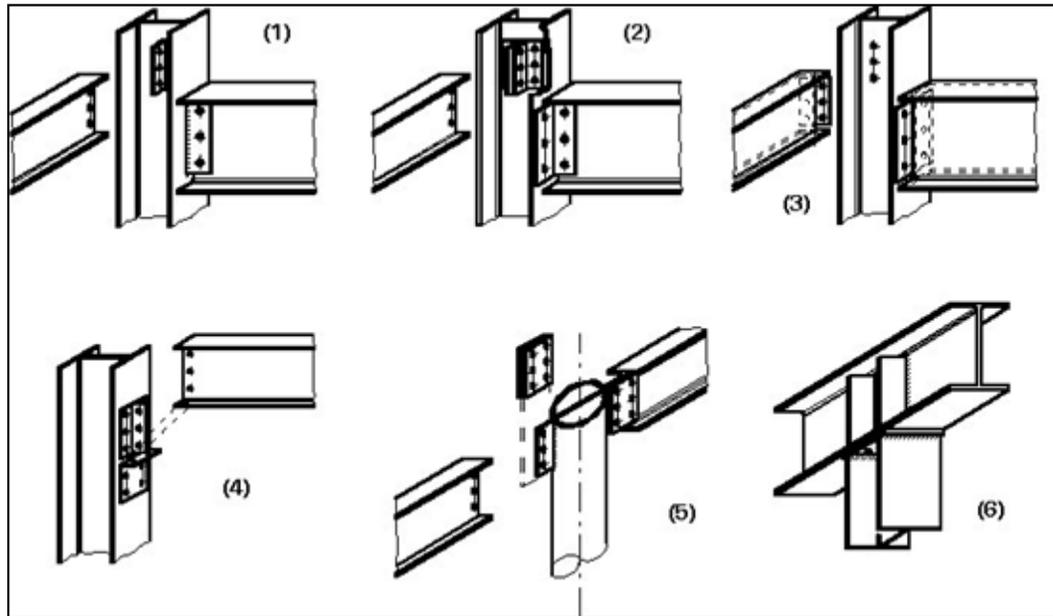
Simple beam to column connection, 1) fin plates, 2) angle cleats, 3) flexible endplate welded, 4) bolted with angle cleats, 5) tube, 6) stiffness plate
